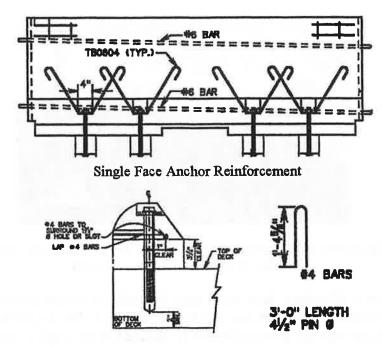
Anchor reinforcement – Nevada (Oregon system)
